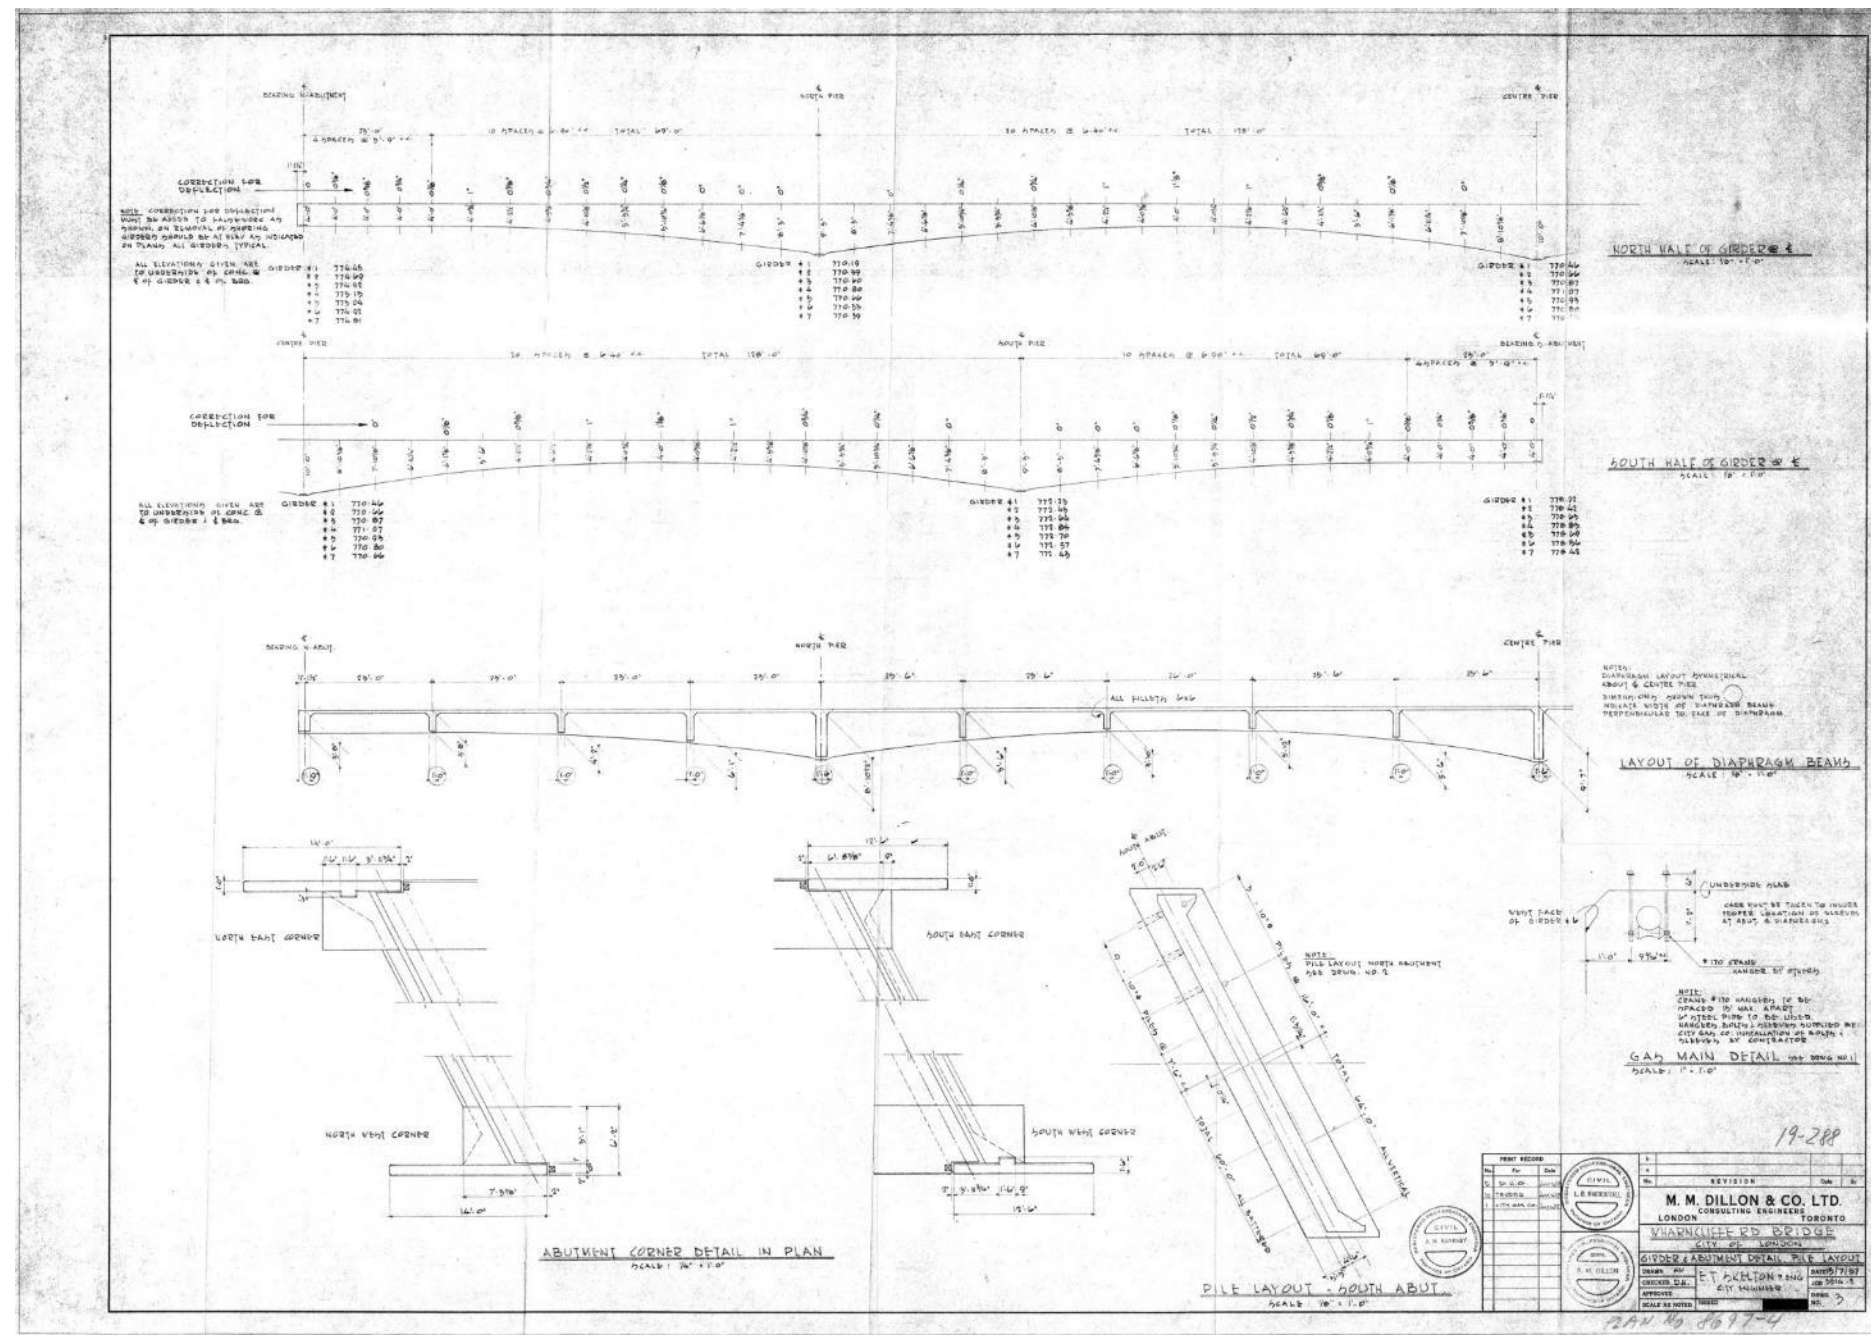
Girder Details of Wharncliffe Road Bridge, 1957
